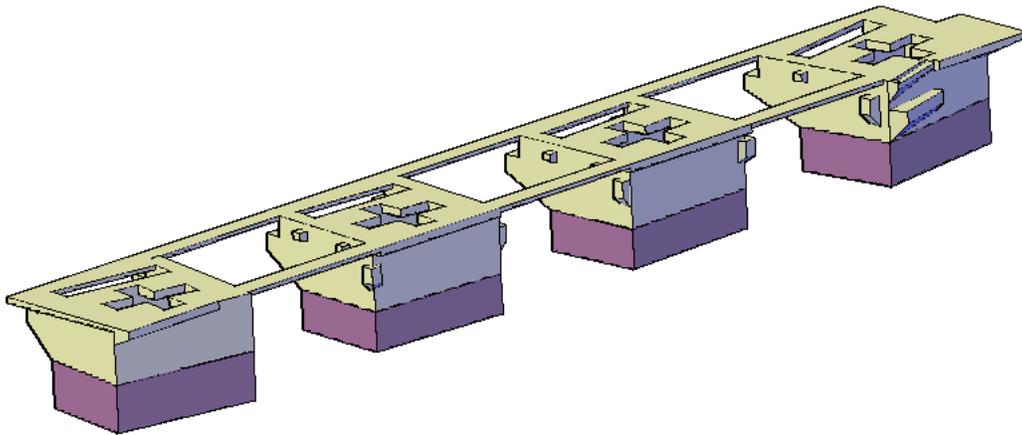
Approximate limits of concrete demolition (shown as tan) of the intake towers, (bridge, equipment, and structural steel not shown for clarity) purple section and below of towers to remain
